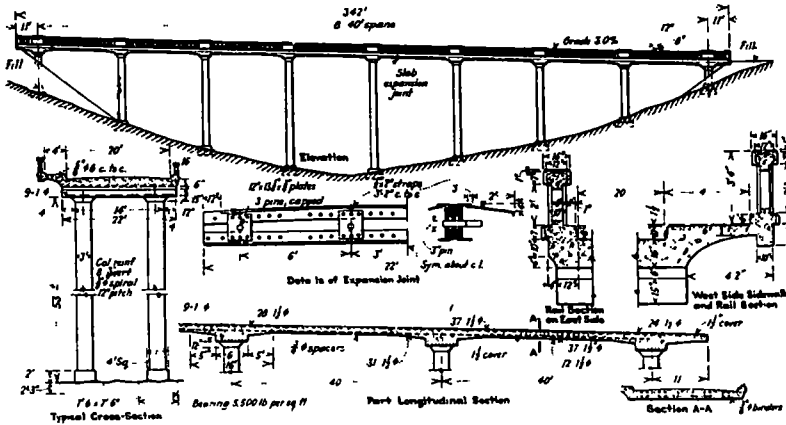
Details of the Woodway Park Concrete Viaduct, Seattle
